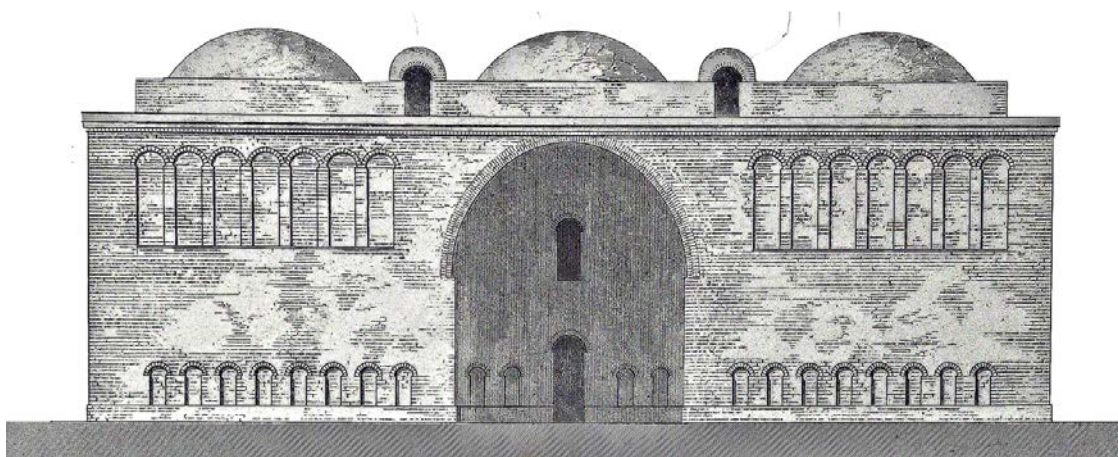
Sarvestan monument a general view of the building masonry, Photo by: B.Sedighi
